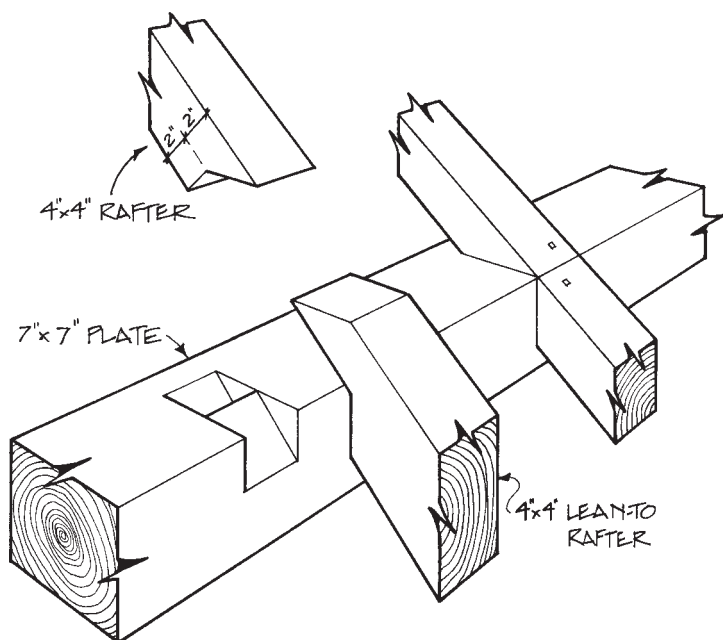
In this early 19th-century Pittsfield, Massachusetts, house, the lean-to pitch matches the main roof pitch and the rafters are beveled in the step-lap seat.
